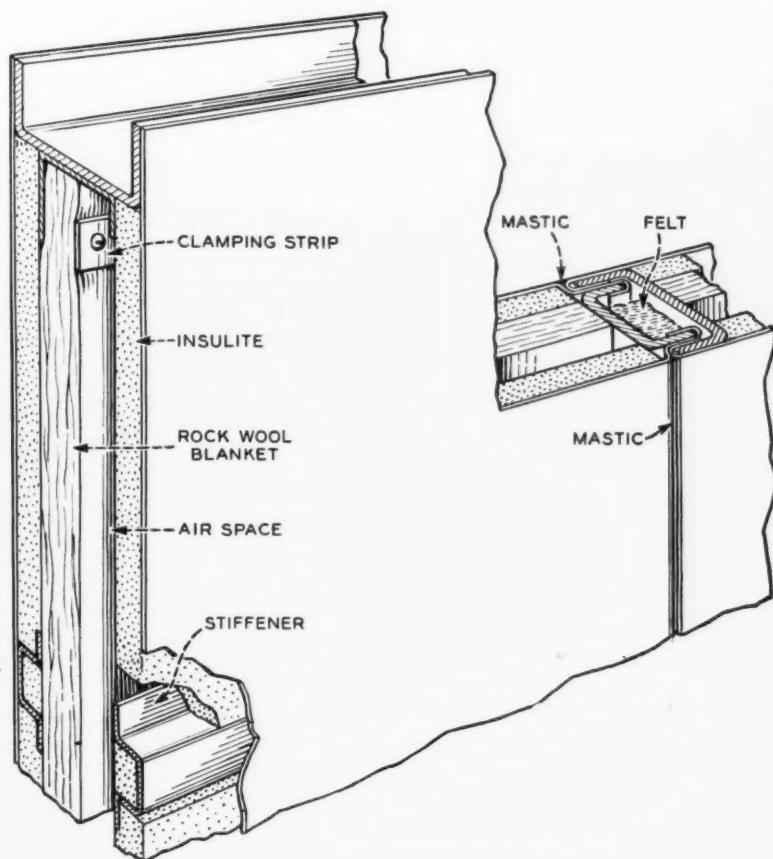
The panels used to construct the soundproof rooms are made of two sheets of steel, three inches apart, with composition board cemented to their inner surfaces, and a rock wool blanket between them
